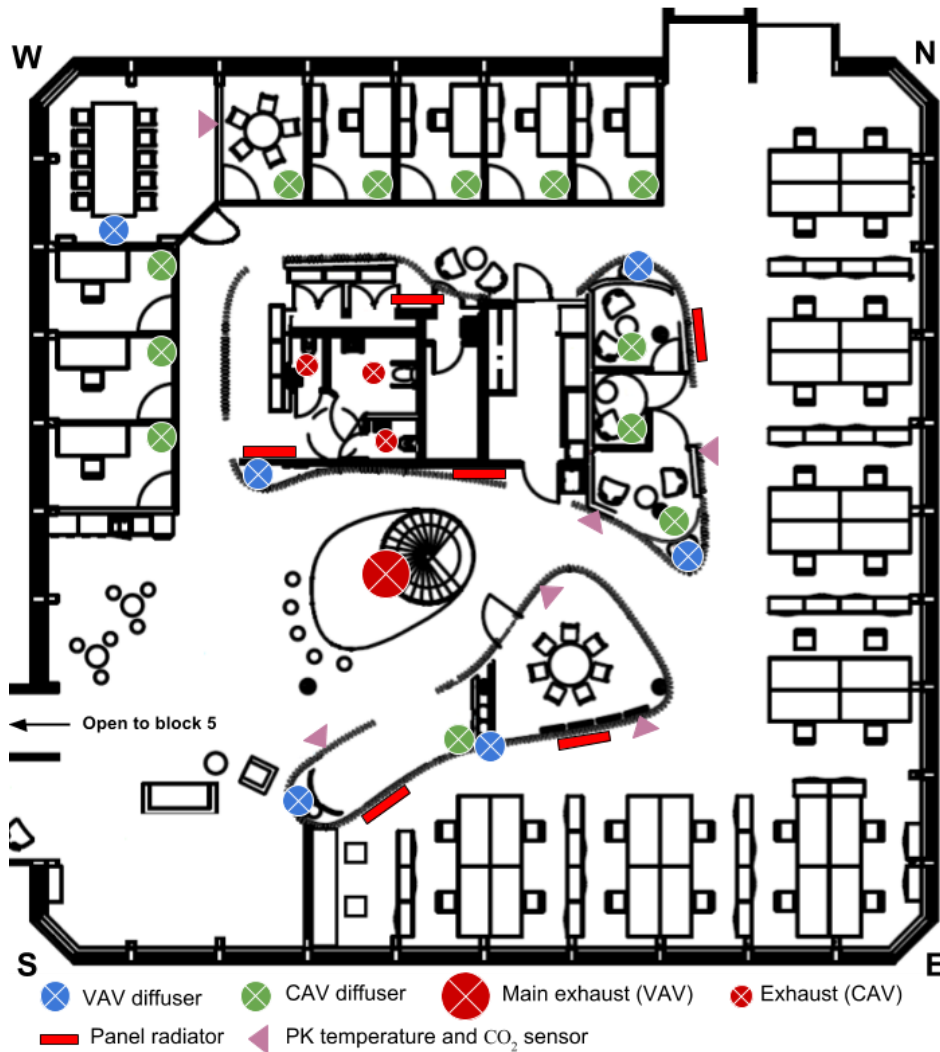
Floor plan of Powerhouse Kjørbo building 4, 2<sup>nd</sup> floor (Søgnen, 2015b)
